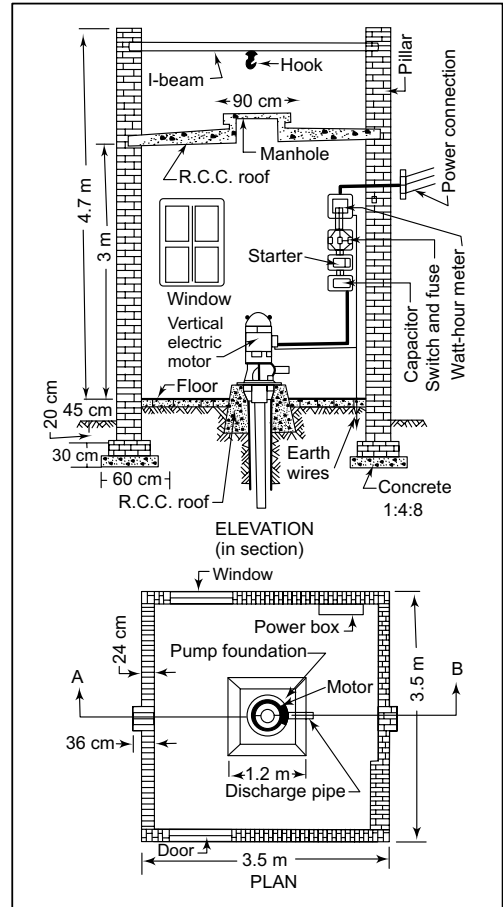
Views of a pump house and electrical connections for installing turbine-type pumps
